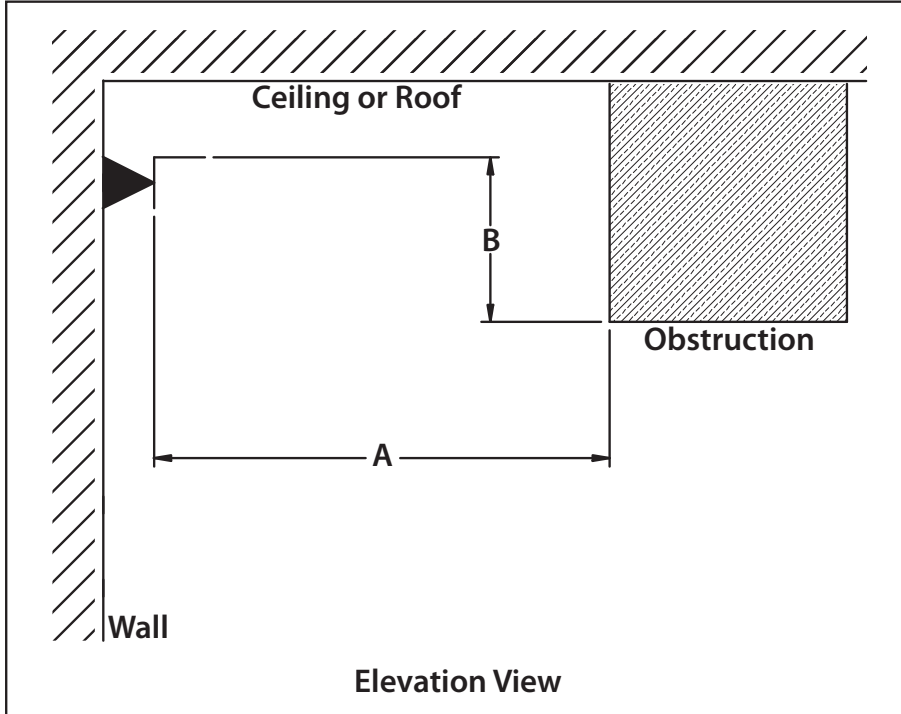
Suspended or Floor-Mounted Obstructions (Residential Pendant and Sidewall Sprinklers)
